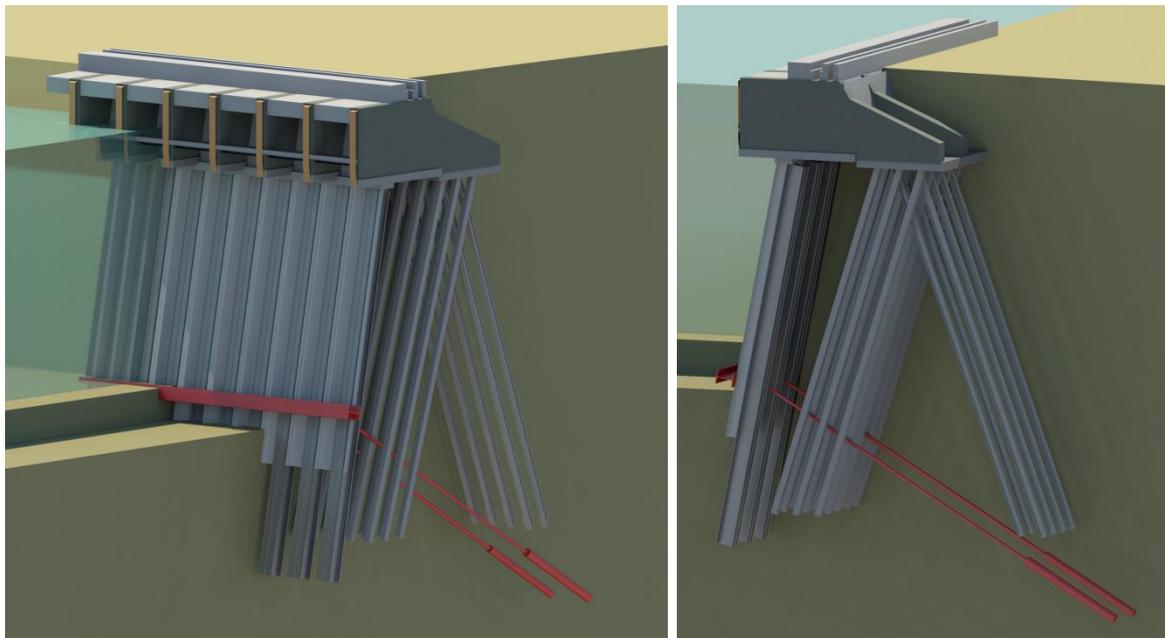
visualisation of the additional underwater anchorage (red) in the existing quay wall
